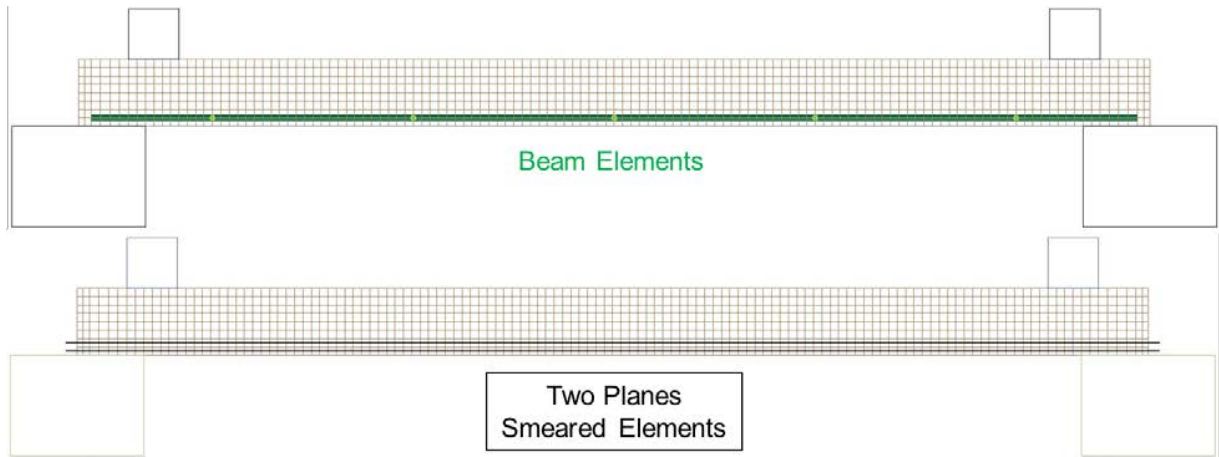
Illustration of two (bottom) rows of concrete elements occupied by the explicit beam element reinforcement or the smeared reinforcement.
